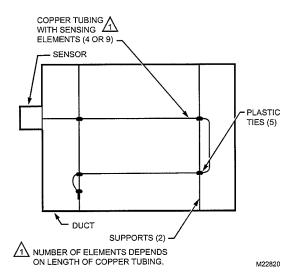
Duct cross section showing method of installing C7021R, C7023R, C7041R Averaging Electronic Sensor.
